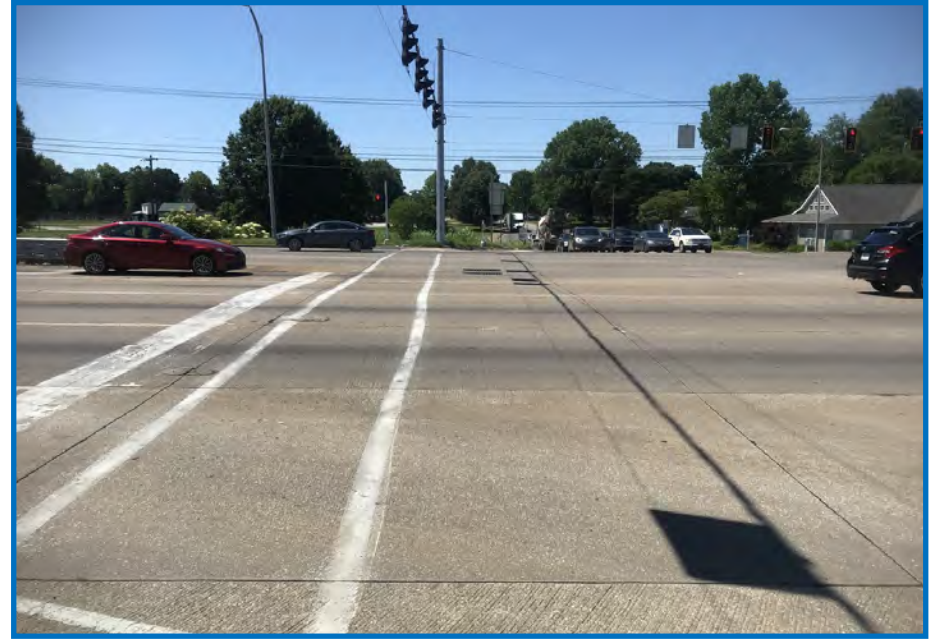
View of the Vann Avenue and Lloyd Expressway intersection facing south (6/15/2021).
